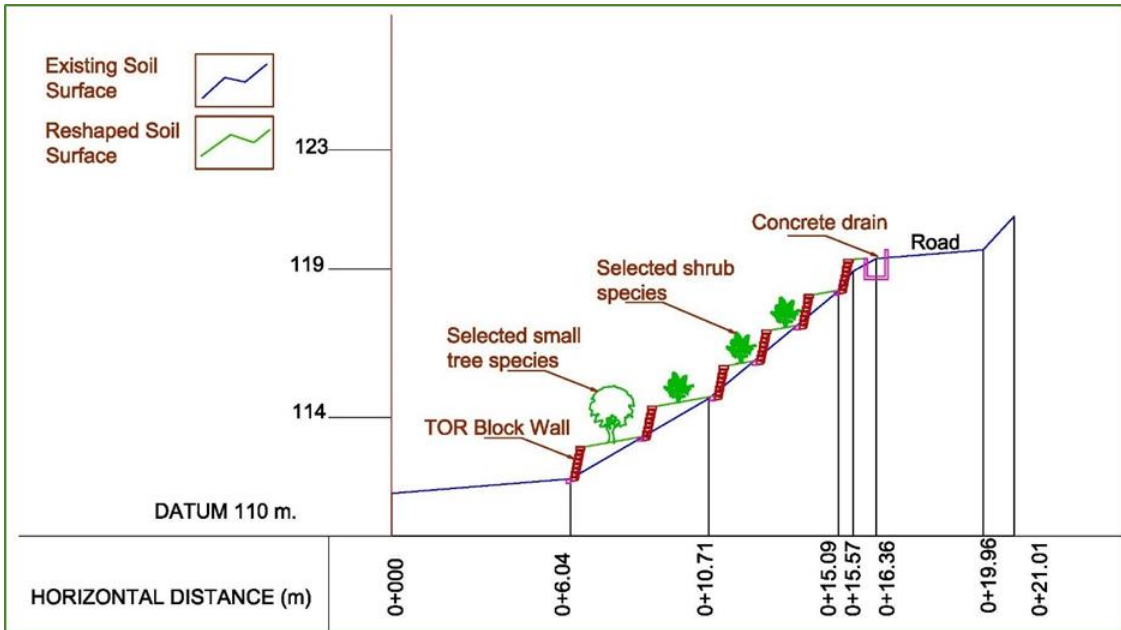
A tiered wall made out of soil-cement blocks with bench plantings
